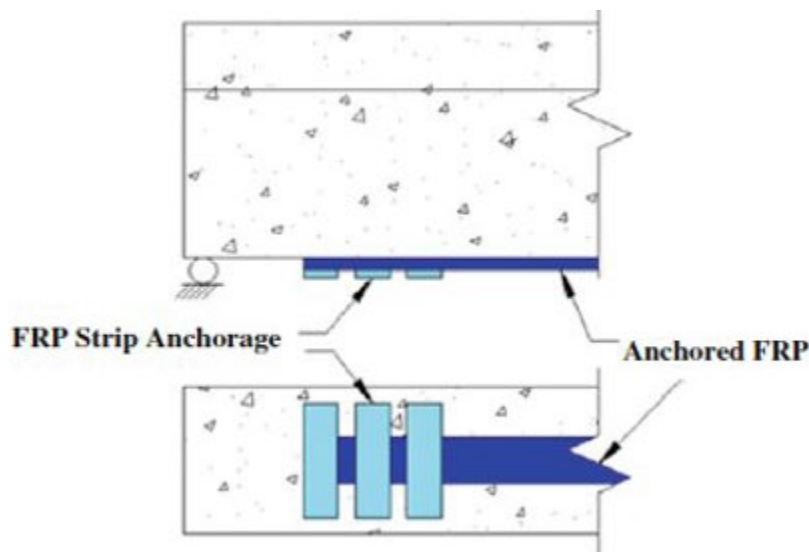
FRP strip anchor (Grelle and Sneed, 2013)
